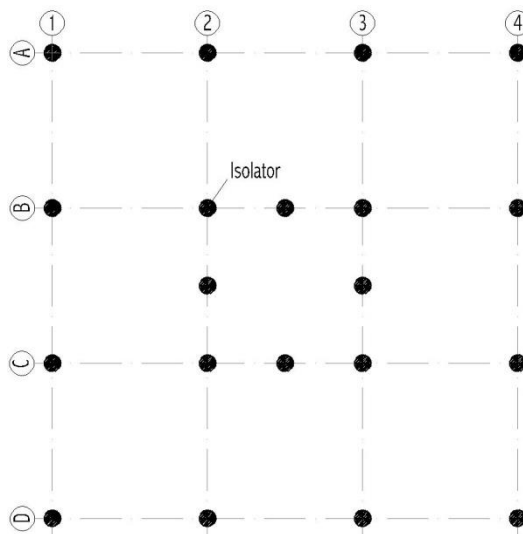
Location of lead rubber bearings for 23-story reinforced concrete building
